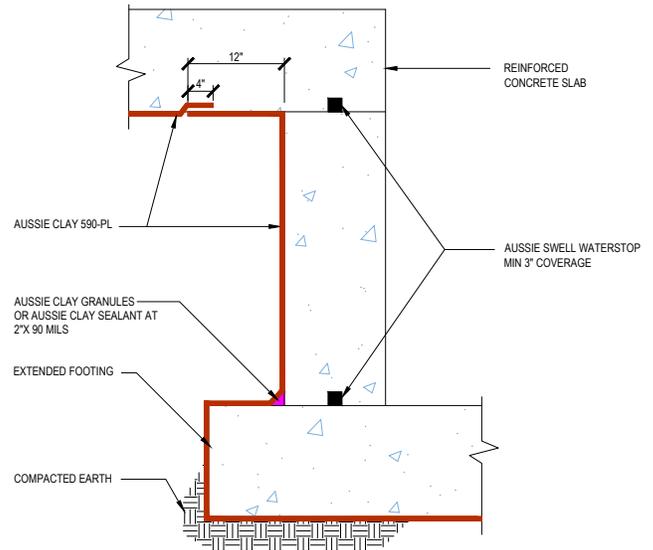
ELEVATOR PIT HYDROSTATIC
